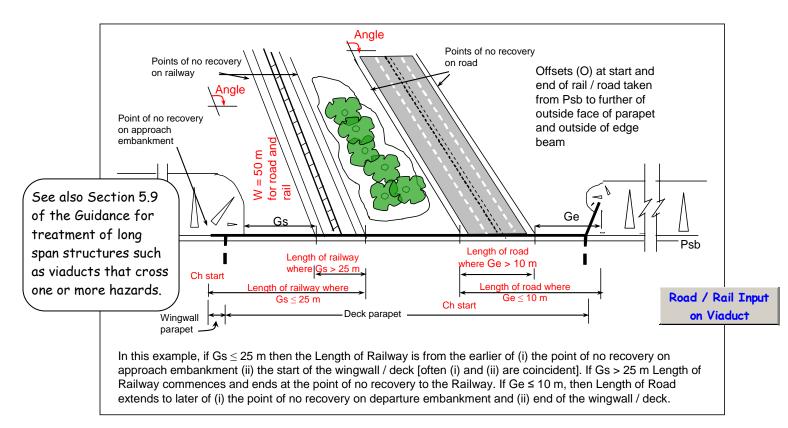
(d) Viaduct with Road and Railway crossing under the Road
